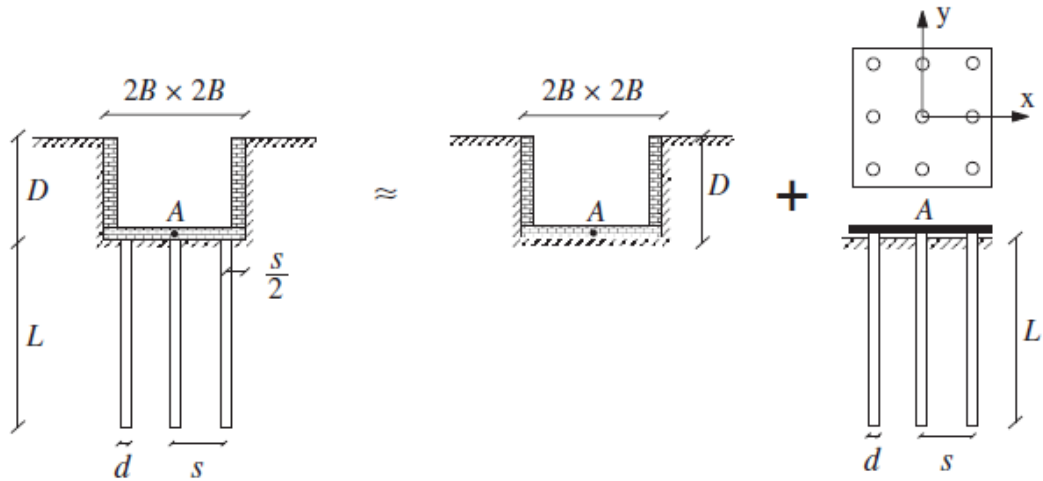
Simple superposition approach to solve embedded footing supported by vertical piles [79]
